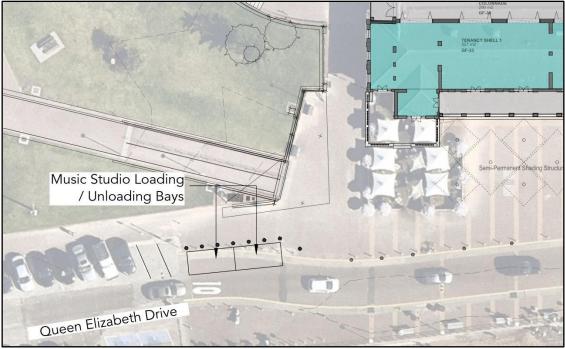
Proposed Loading Bay – Queen Elizabeth Drive (Source: PTC)
